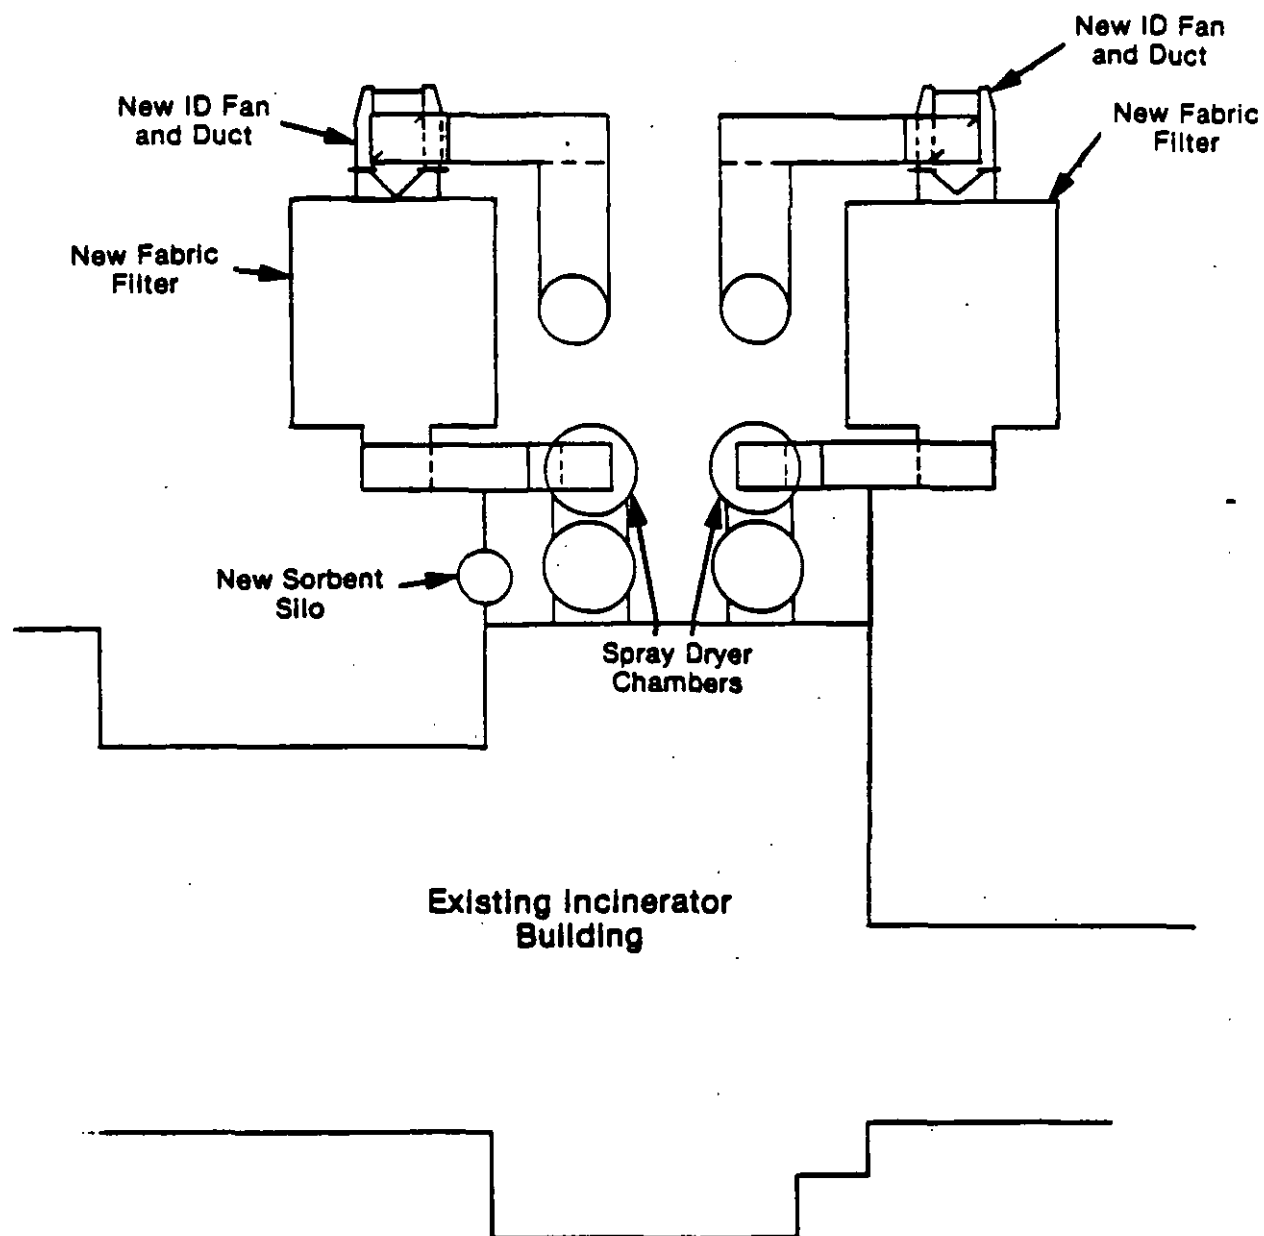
Plot Plan of Spray Dryer/Fabric Filter Retrofit Equipment Arrangement.
